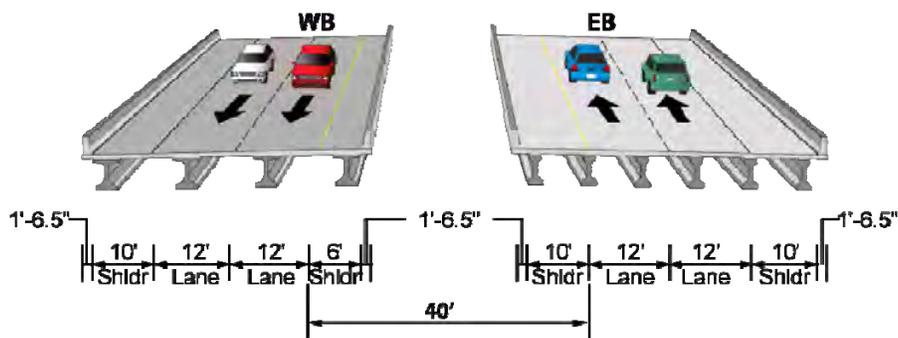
Bridge Typical Section without Shared Use Path
